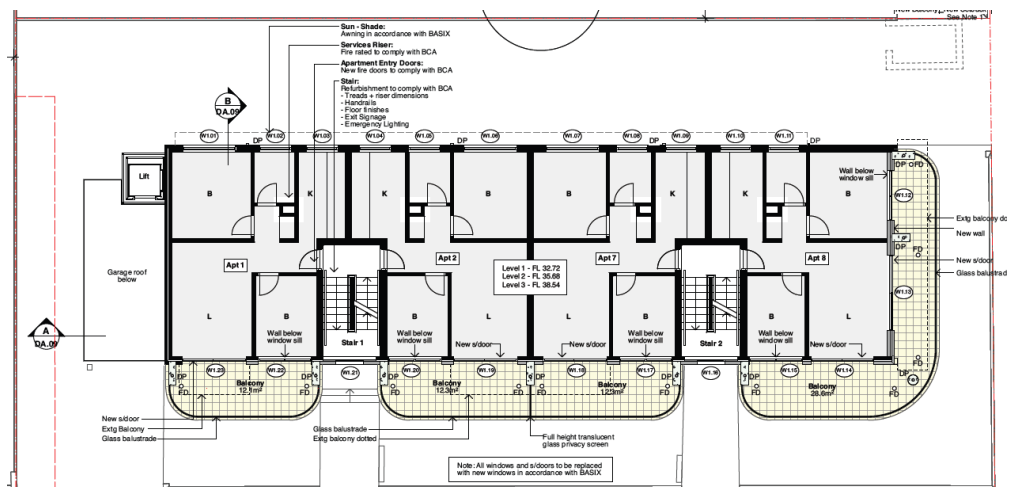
Proposed first, second and third floor plan – 10 Major Street, Coogee (Source: Ken Powell Architect)
